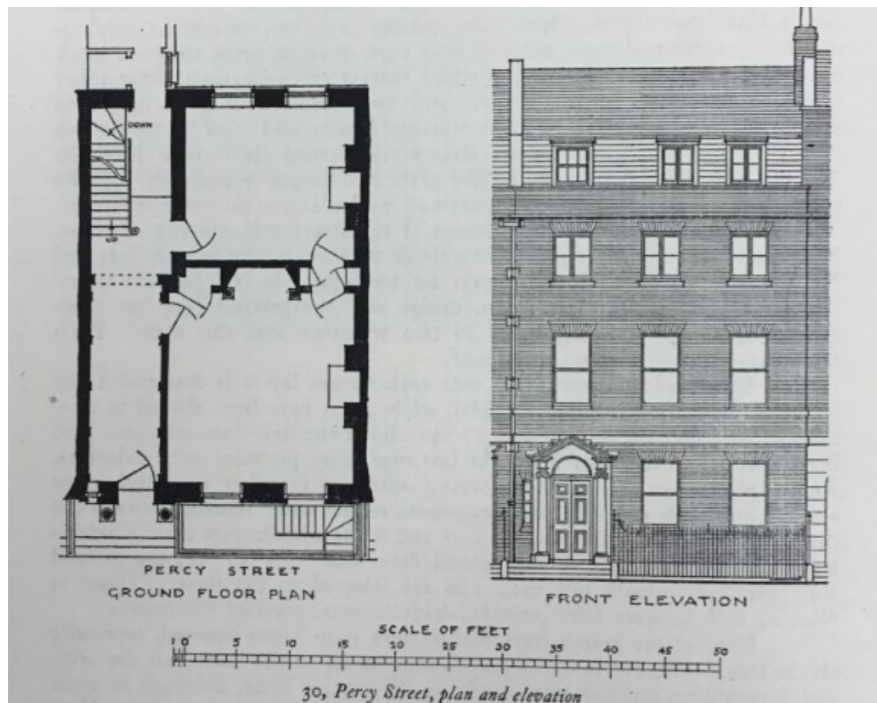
Typical arrangement of houses on Percy Street prior to bomb damage and alteration
